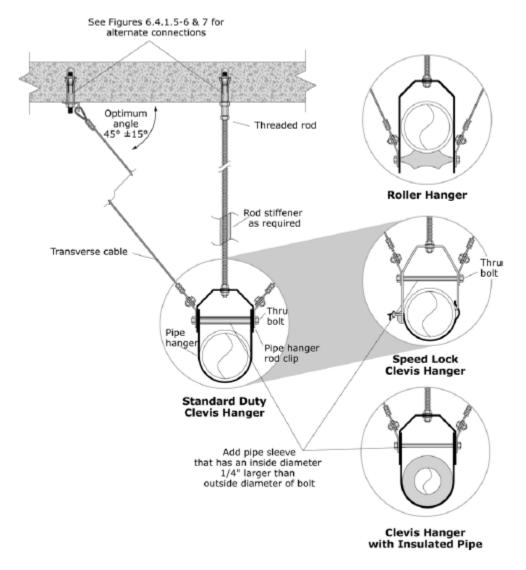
Cable Bracing – Single Pipe Transverse. (FEMA E-74, 2012, Reducing the Risks of Nonstructural Earthquake Damage)
